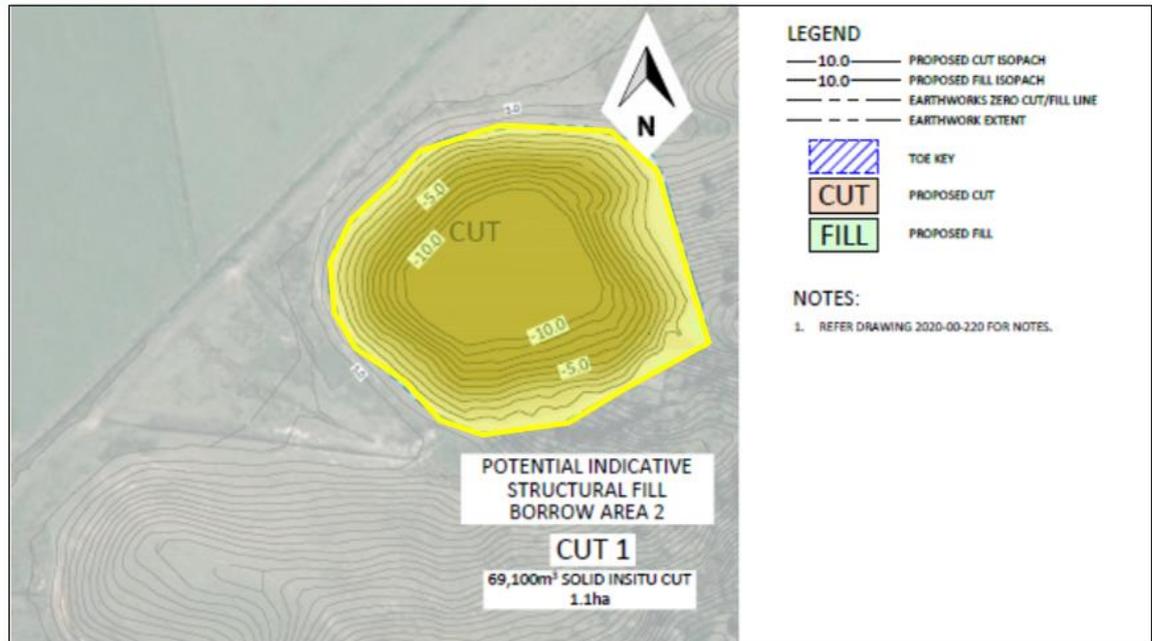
Cut fill plan of Borrow Area 2 with area recommended for archaeological monitoring shaded yellow (source: Civil Plan Ltd)
